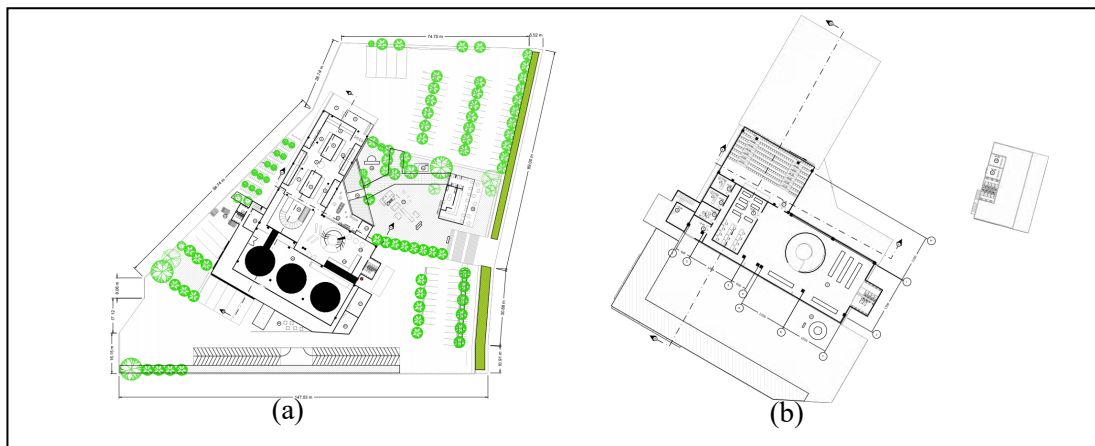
(a) Ground Plan, (b) Second-Floor Plan
